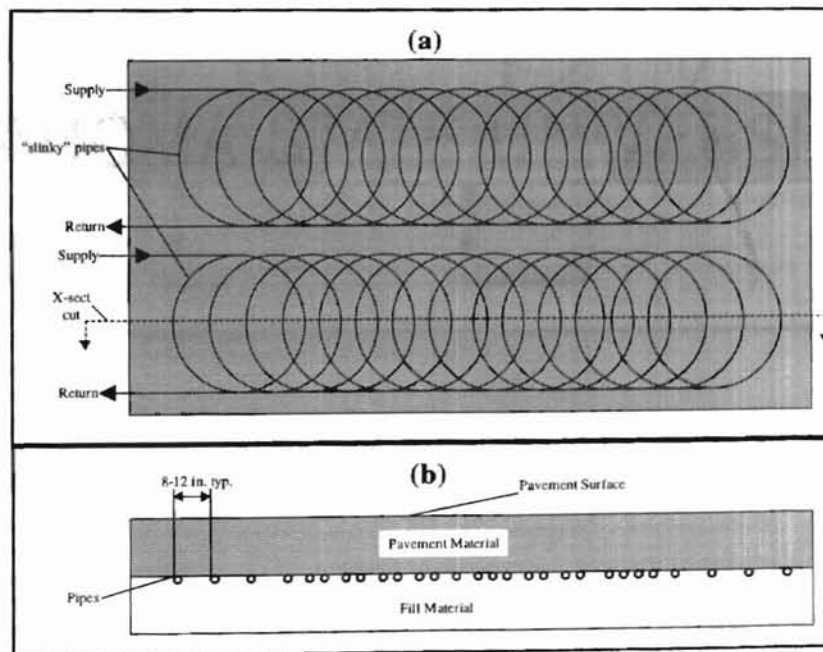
Slinky pipe configuration in a hydronically-heated pavement slab in (a) plan view and (b) cross-sectional view along the slinky center-line.
